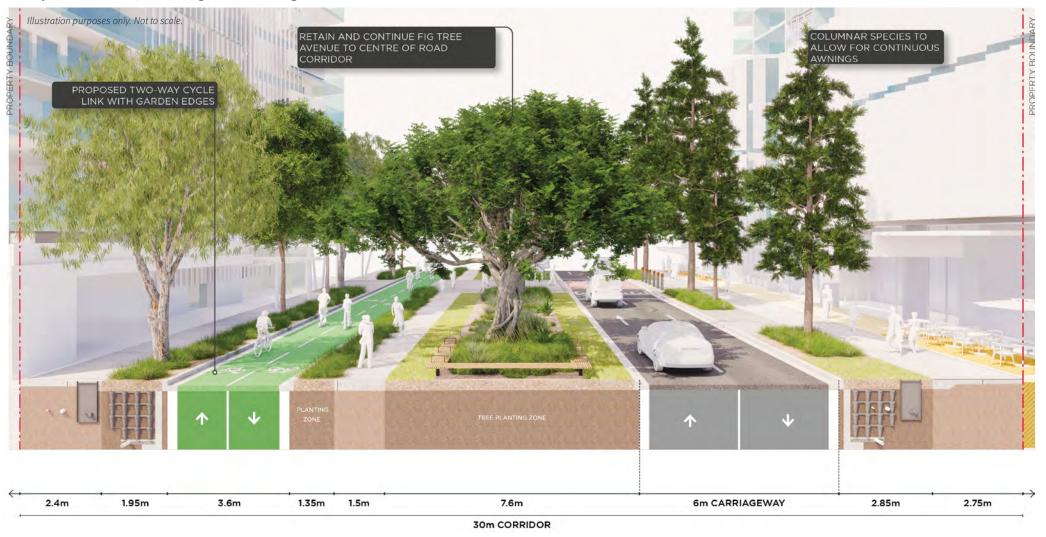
Cross section - Logan Road - subtropical boulevard (minor)
